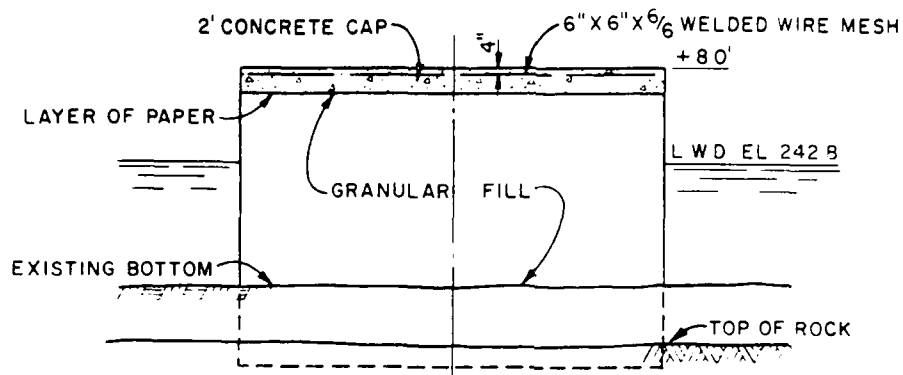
Typical pier cross sections, Olcott Harbor, New York
